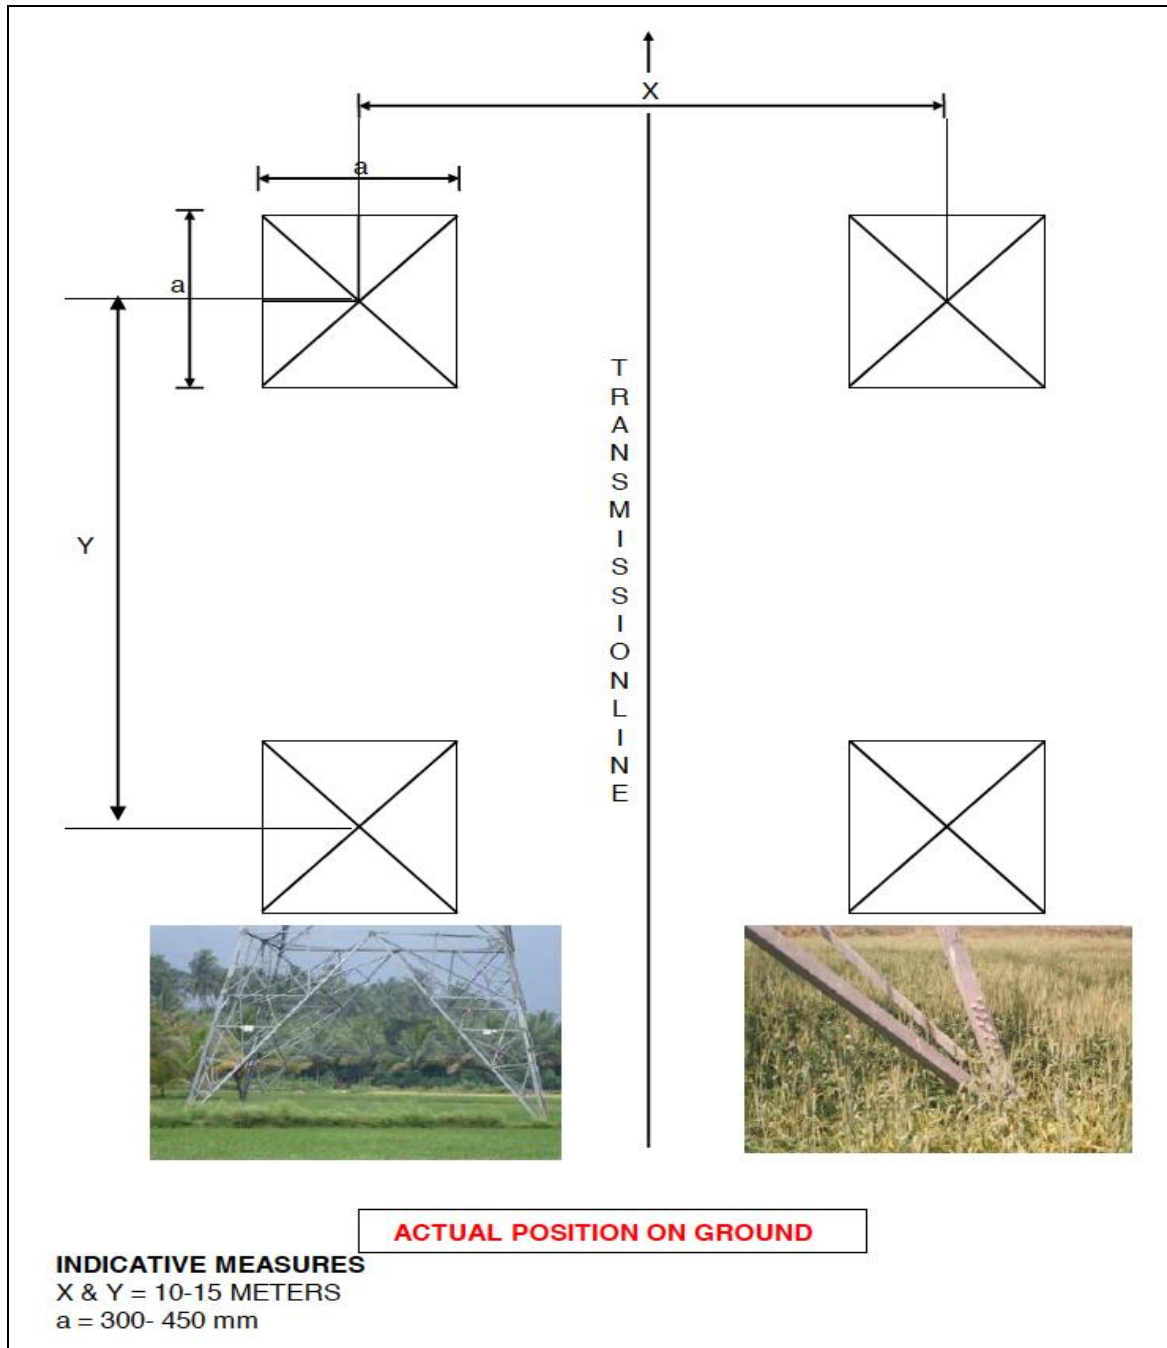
Typical Plan of Transmission Line Tower Footings Showing Actual Ground Position and Extent of Impact
